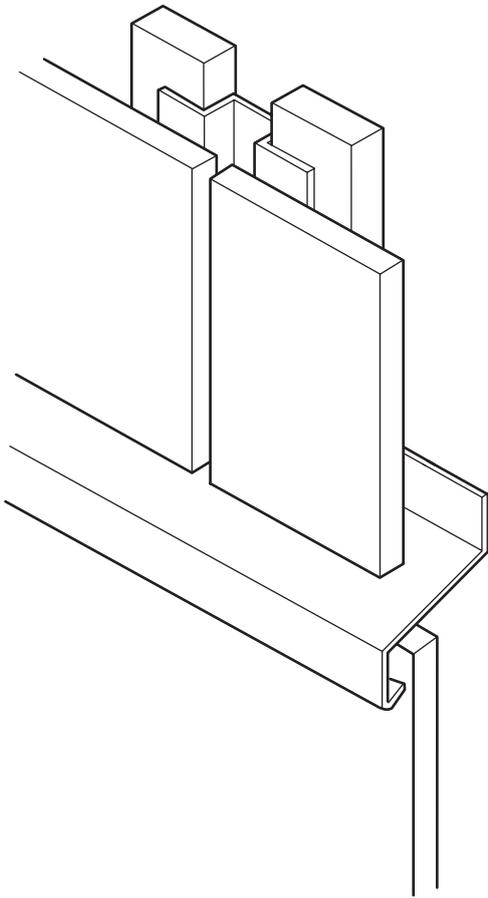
Vertical and horizontal external cladding joints using pressed metal 'top hat' and drained bottom bead profiles to allow drained and ventilated cladding
